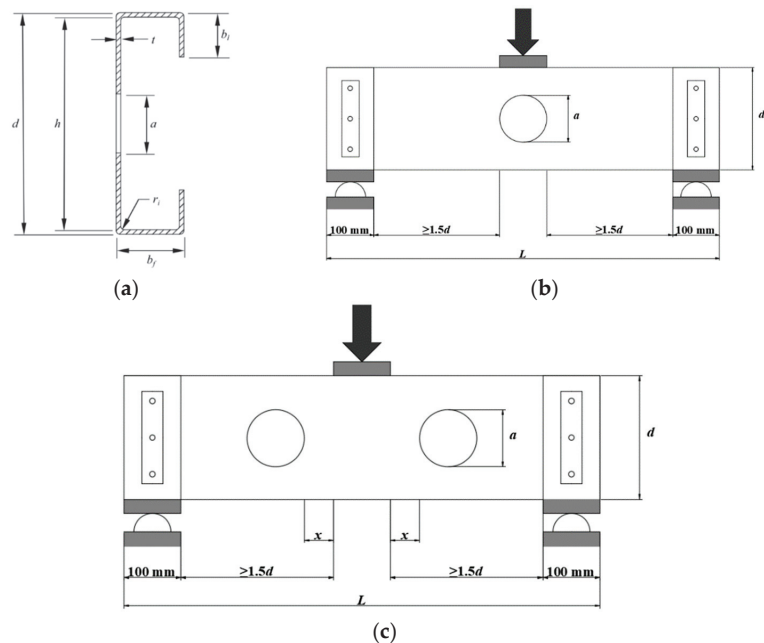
Definition of symbols and loading cases: (a) Section dimensions; (b) sections with centered holes from the bearing plate under IOF; (c) sections with offset holes from the bearing plate under IOF.
